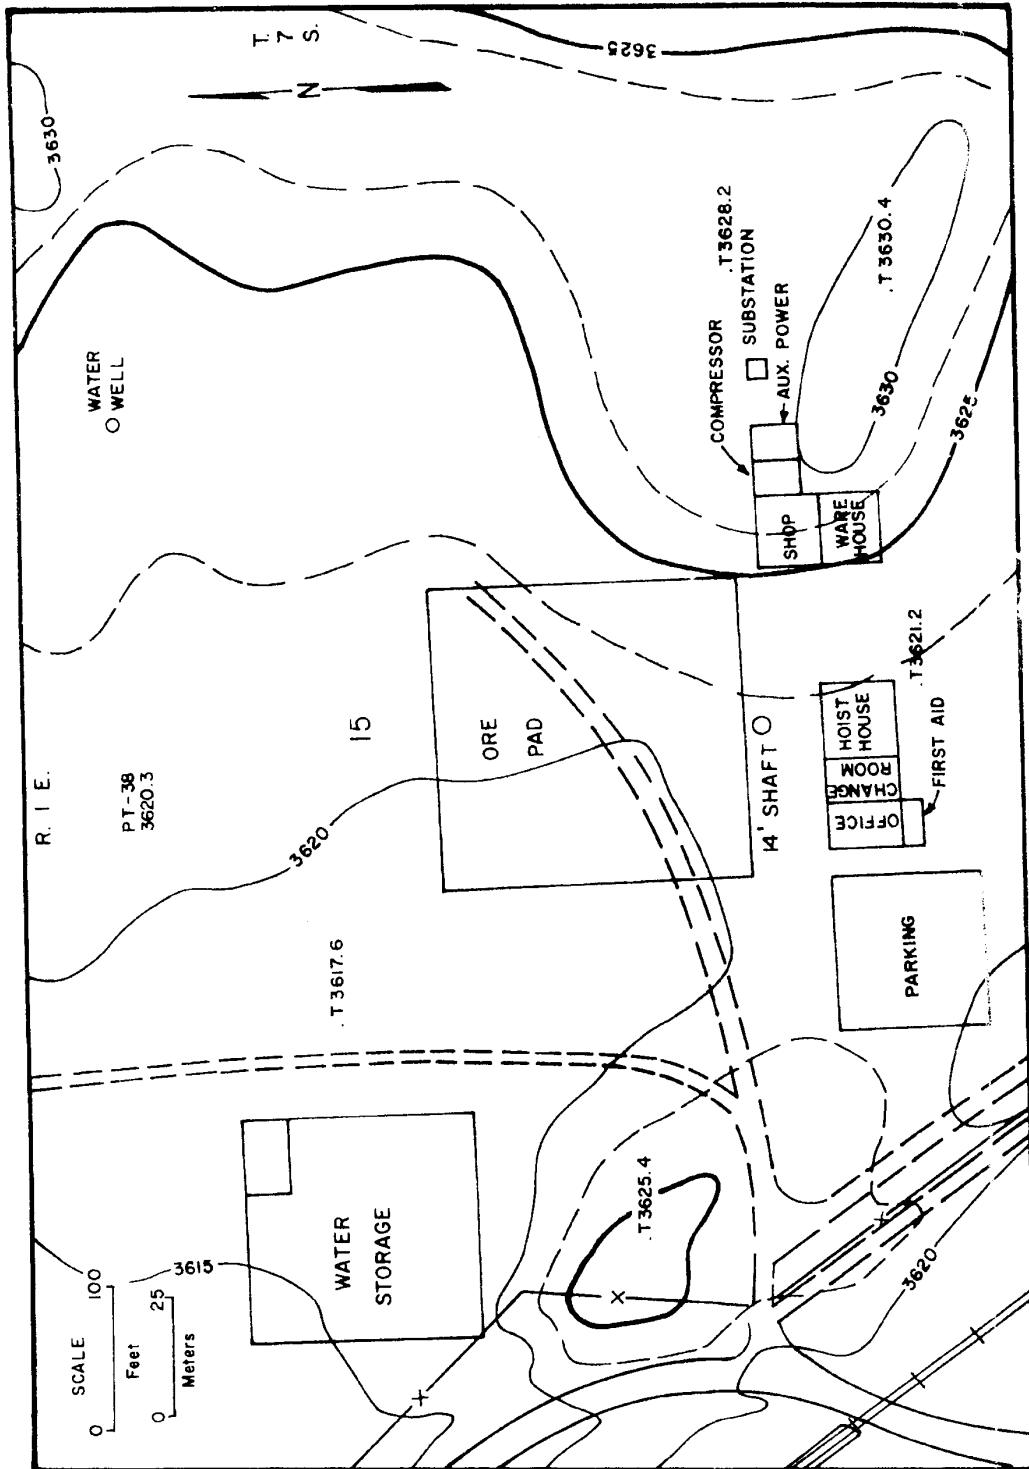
Proposed Initial Shaft Site Layout
